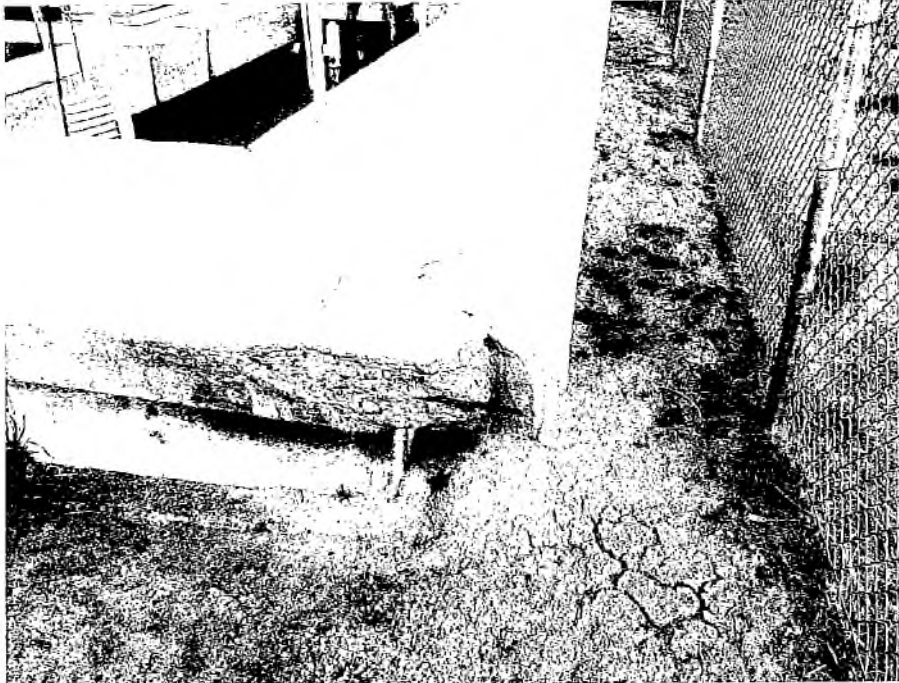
Deteriorated concrete and corroded reinforcing steel at the northwest corner.
